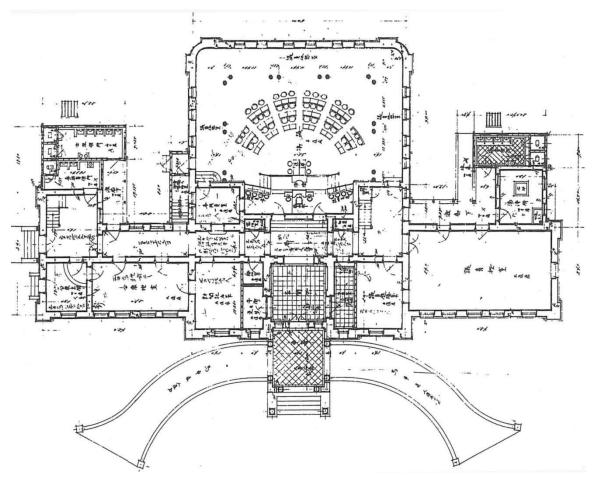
Plan of first floor in 1916, when the Assembly Building was constructed
